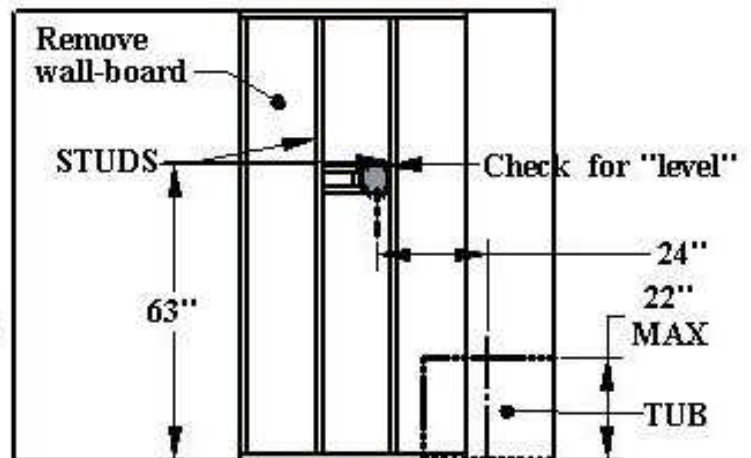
TYPICAL WALL-BRACKET INSTALLATION
